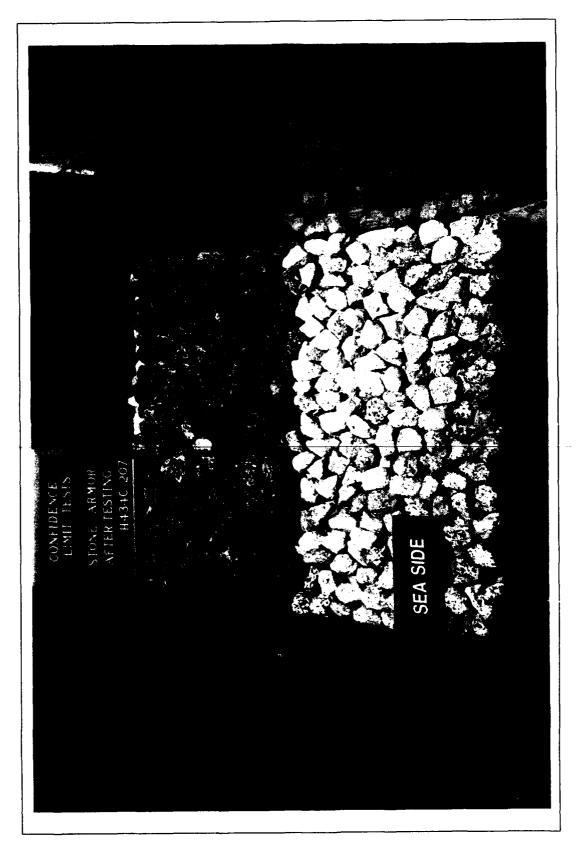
Seaside view of Structure 1 after completion of a typical repeat test
